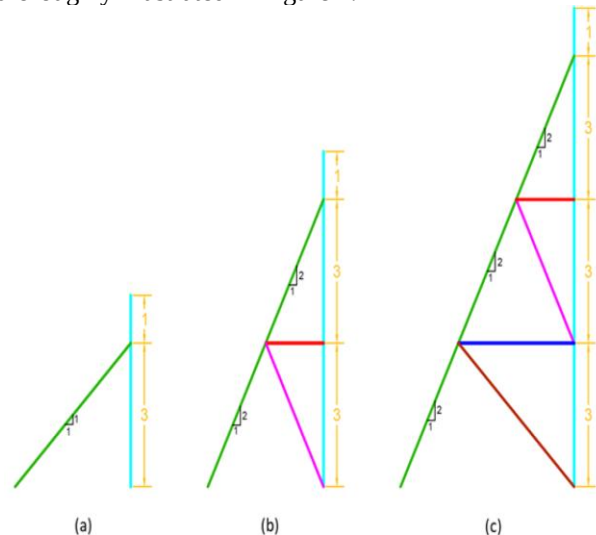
Geometrical configuration and member layout of the truss retaining system for various depths
